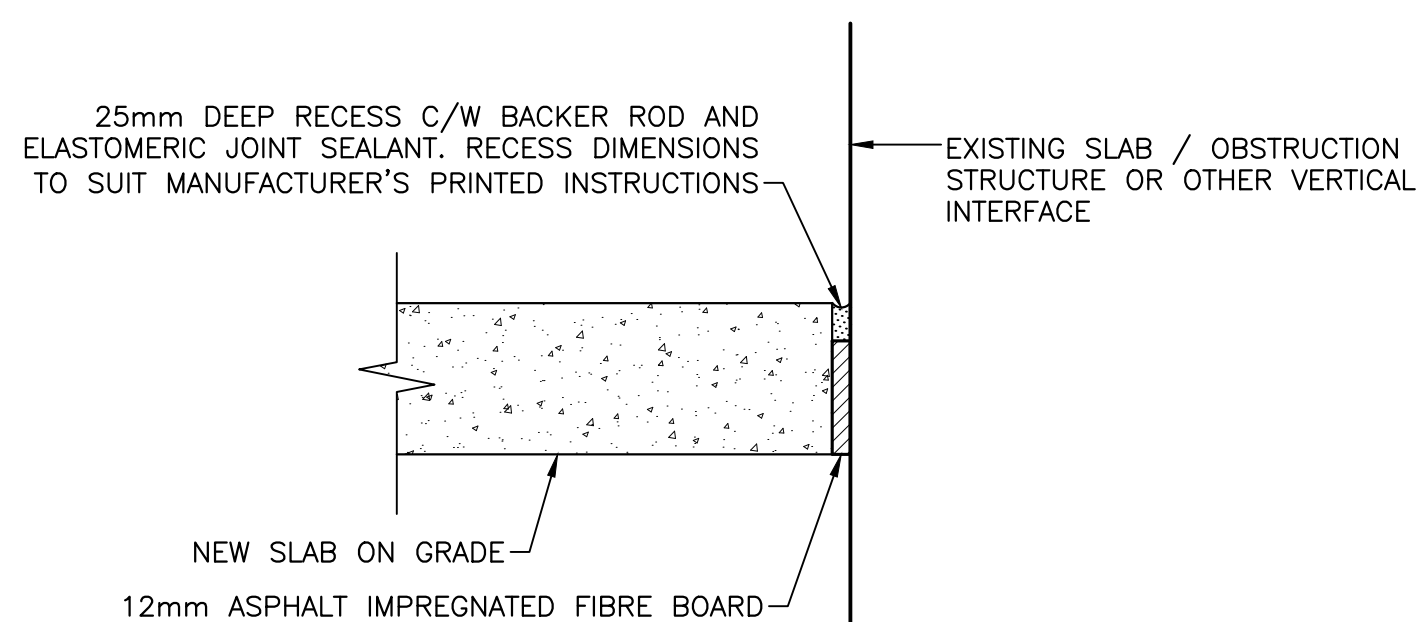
DETAIL — BUILDING 20 CATTLE YARD SLAB 4 S04/S04
